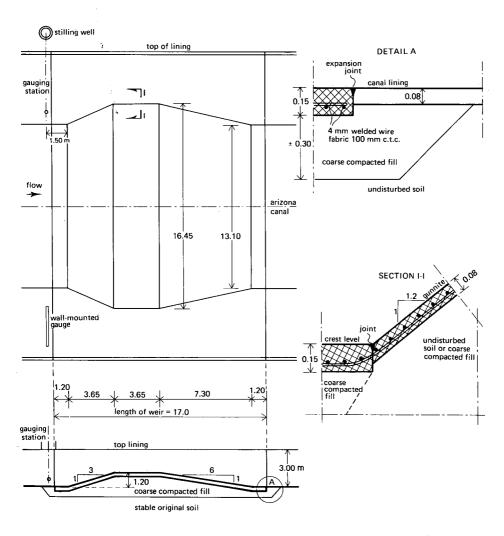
Construction drawing of large weir on the Arizona Canal. All dimensions are in meters.
